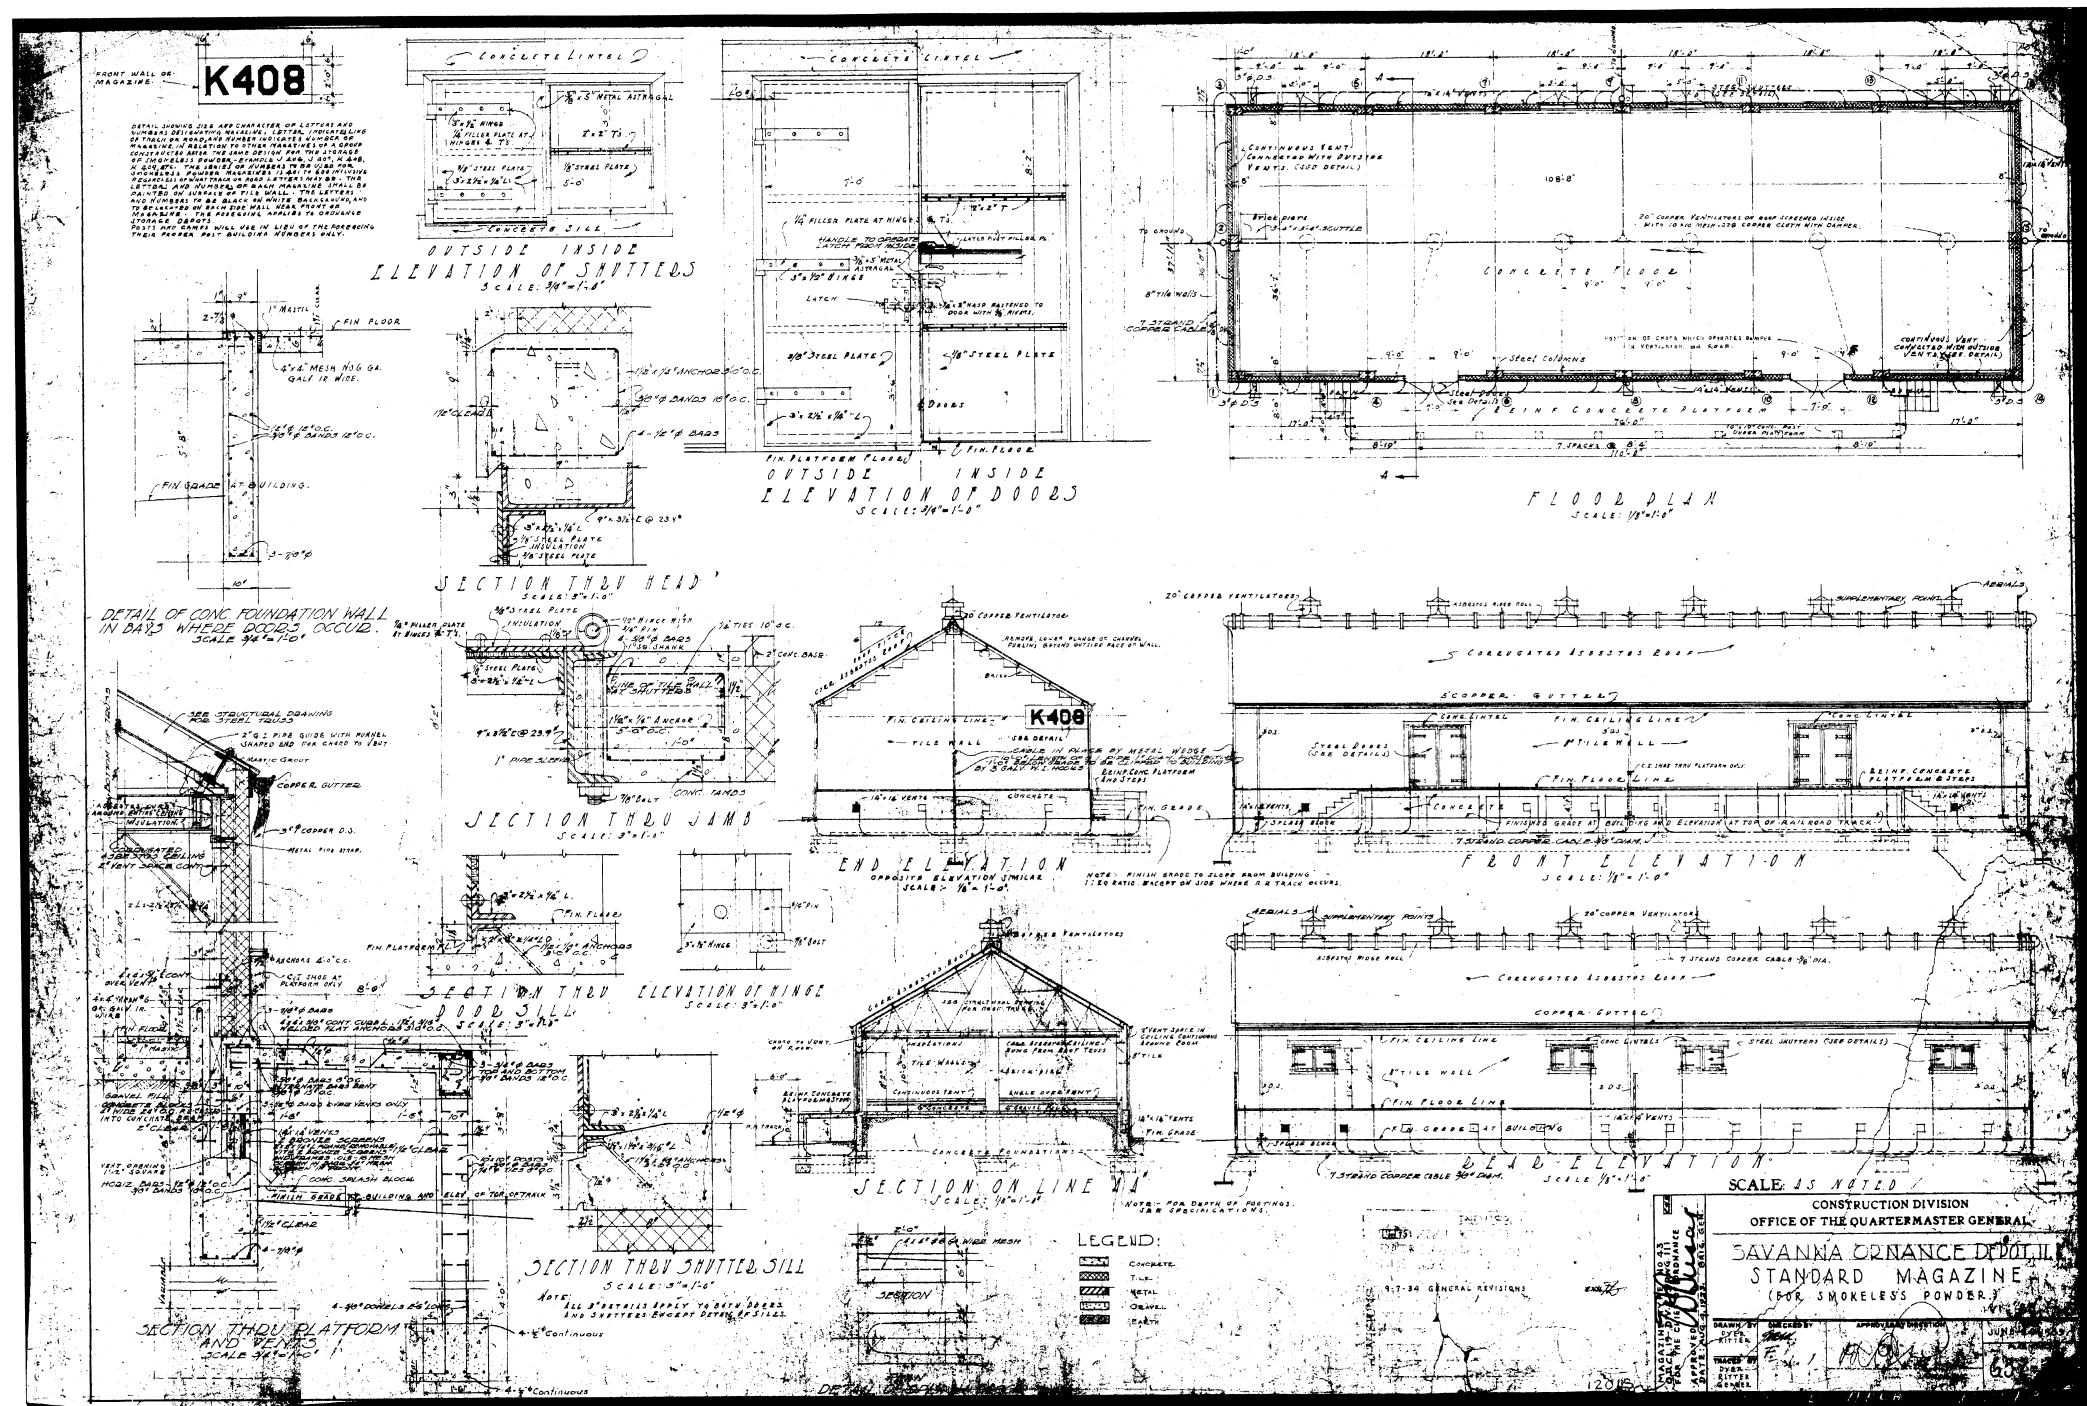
Plans and elevations for standardized aboveground magazine for smokeless powder.
